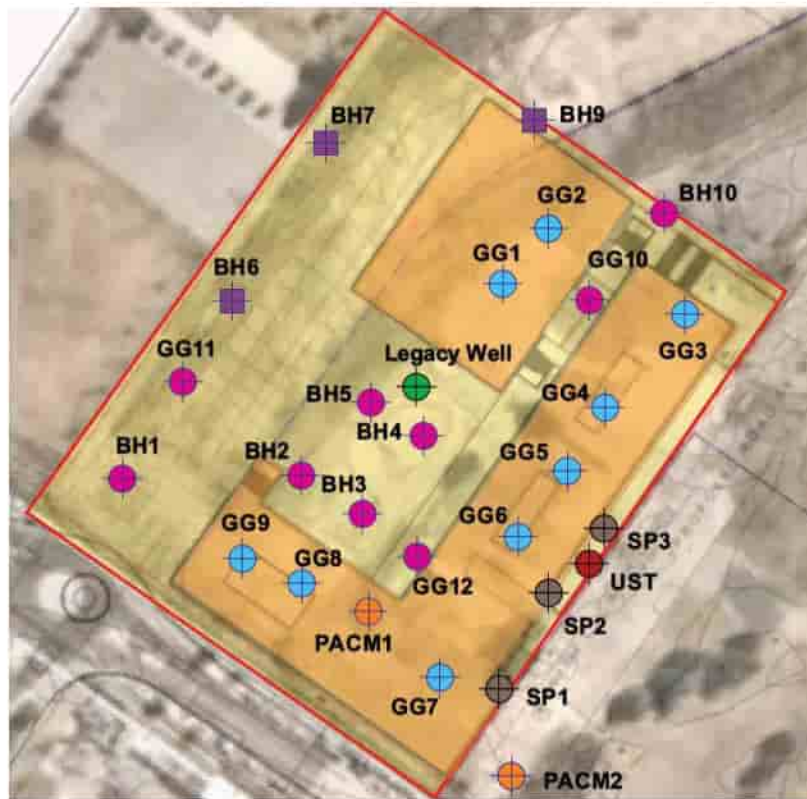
Site Layout Plan – Previously Capped Area from Zoic (2019) Works
